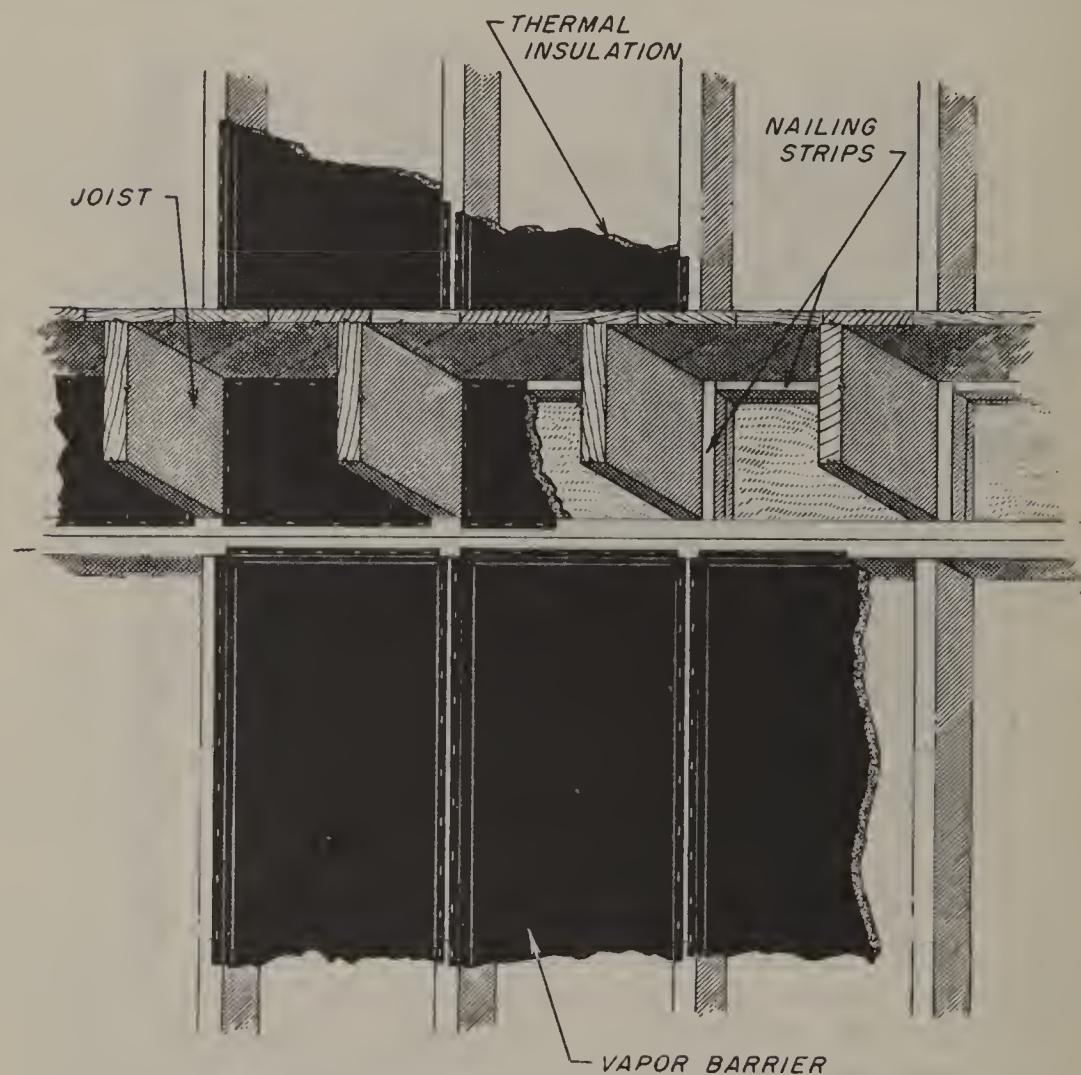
Vapor barrier and thermal insulation at wall-floor intersection at second-floor level.* This drawing features the installation of vapor barriers for condensation control and thermal insulation of the blanket type faced with a vapor barrier. The detail is similar to that shown in figure 32 except that blanket insulation faced with a vapor barrier is illustrated. Special care should be given to the application of the insulation and vapor barrier between the joists.
